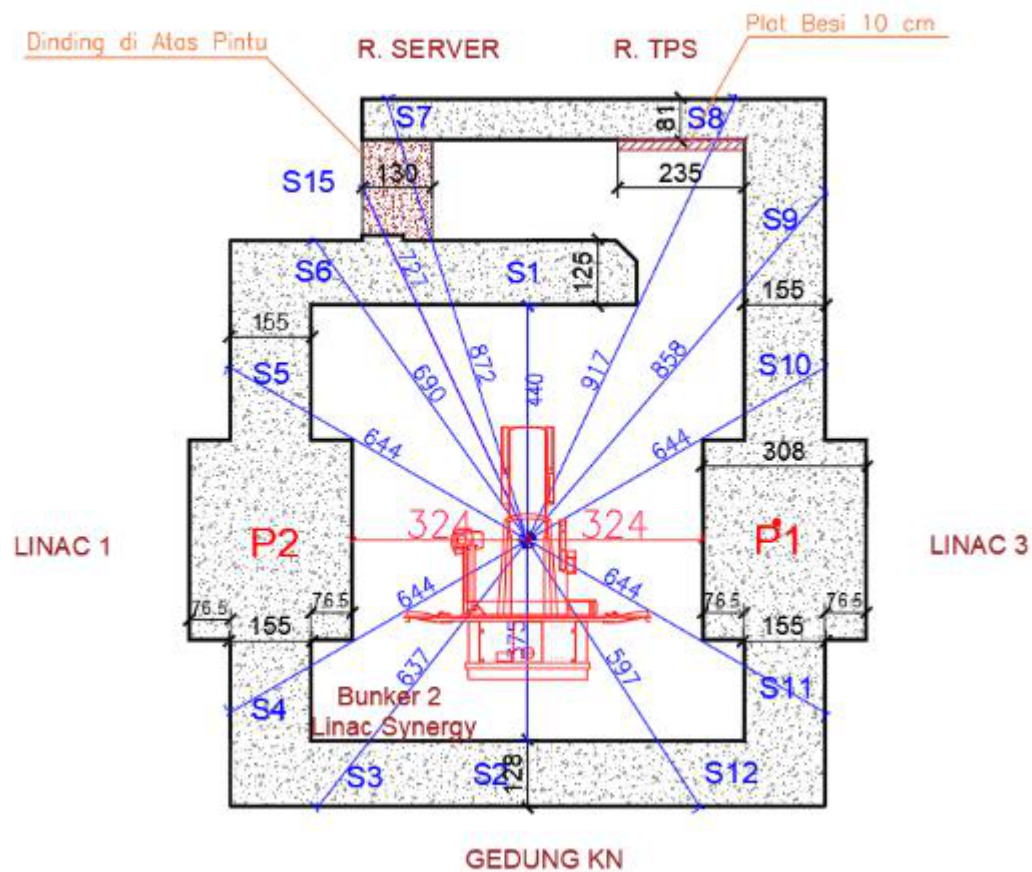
Floor plan of the LINAC Synergy room and its surroundings [19]
